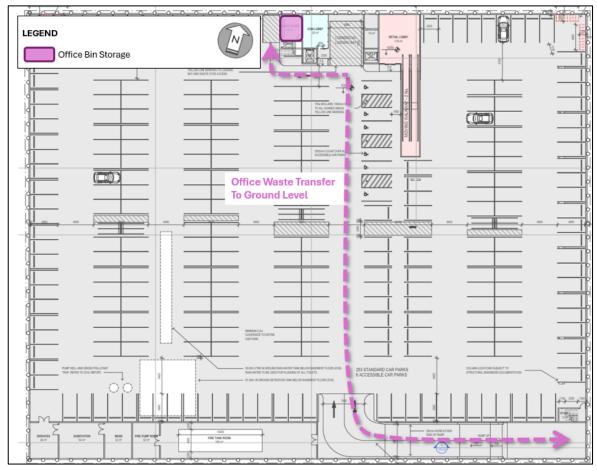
Basement Level - Proposed Storage Area and Waste Transfer Route
